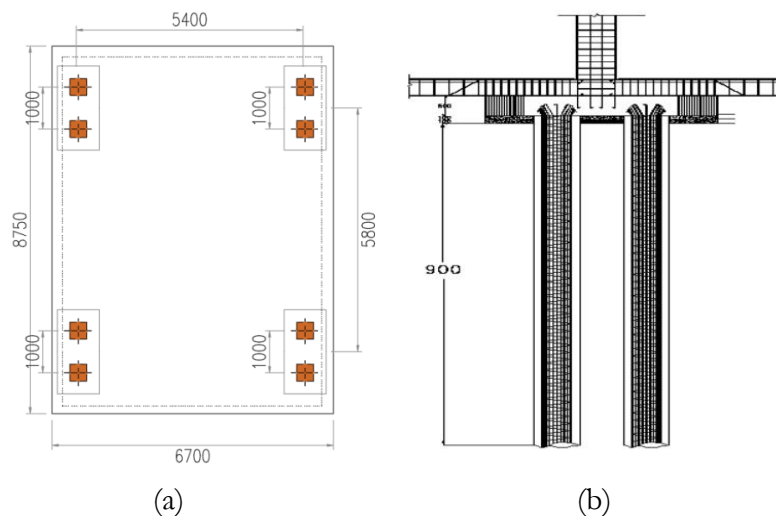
(a) Foundation Configuration Plan, (b) Details of Pile Foundations
